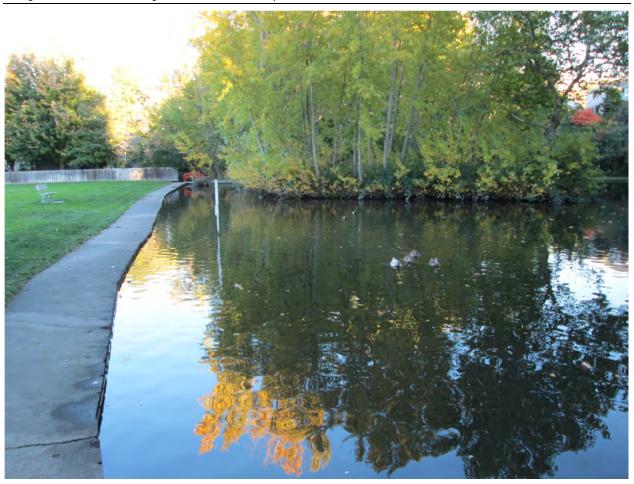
Tree covered island. Facing from near existing pond outlet toward the east and the new proposed inlet.
